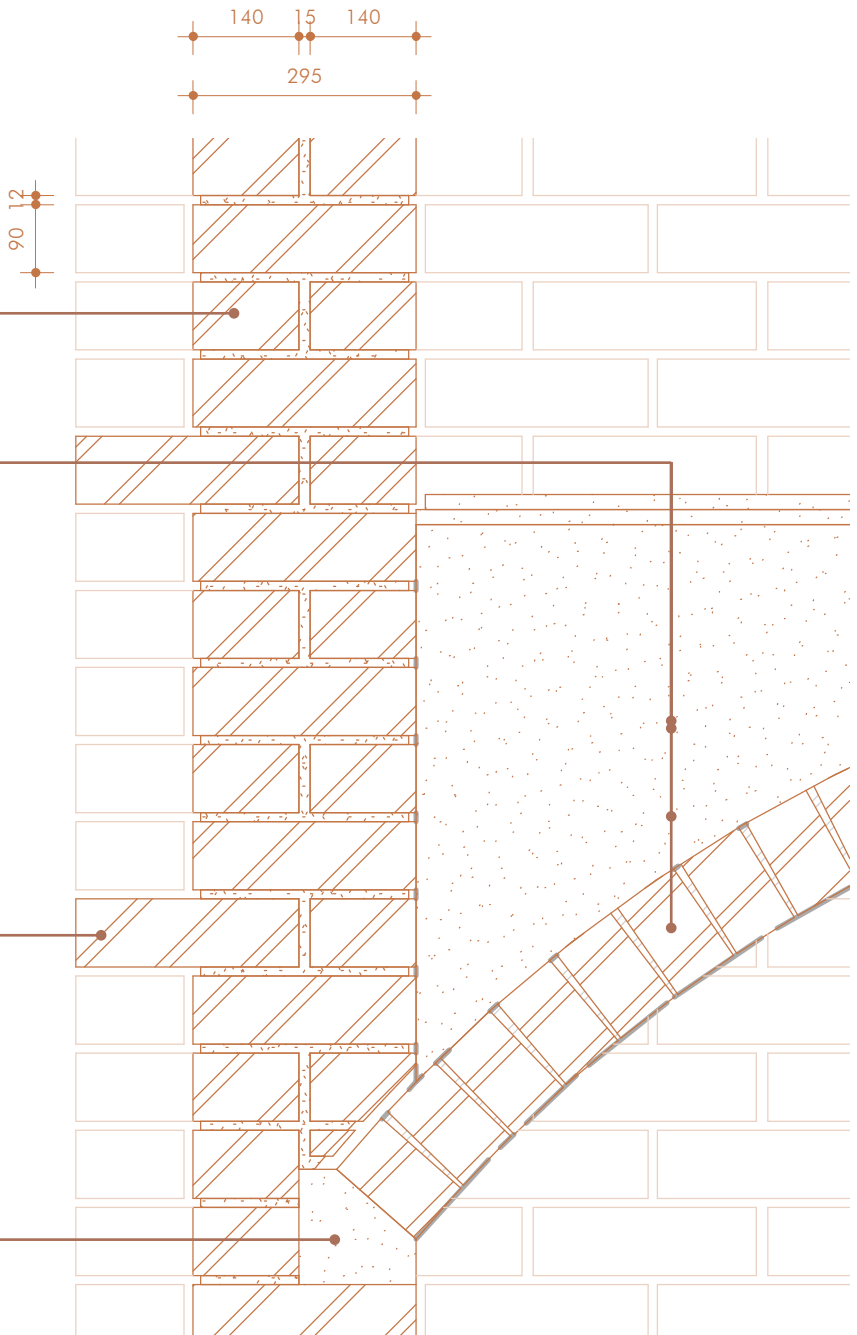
Detail Gable Wall & Masonry Vault [Scale 1:10]
